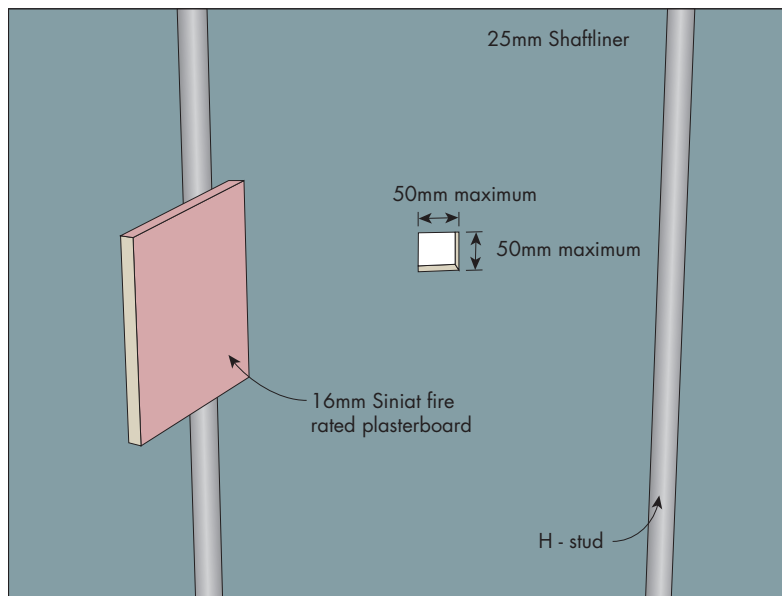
Plumbing and Electrical Penetrations in Wall Linings
